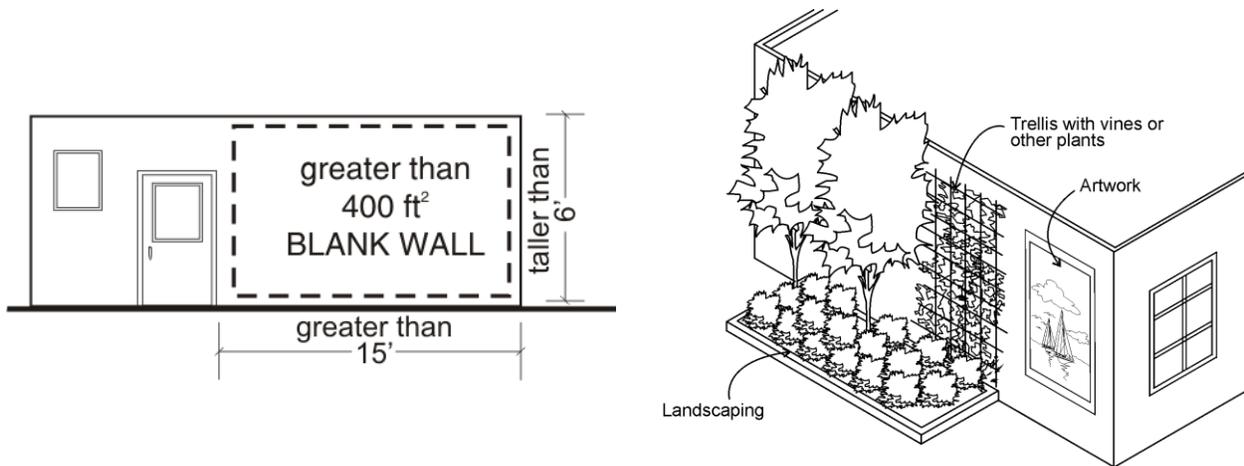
B.30.340a. Blank wall definition and examples of acceptable treatments.
